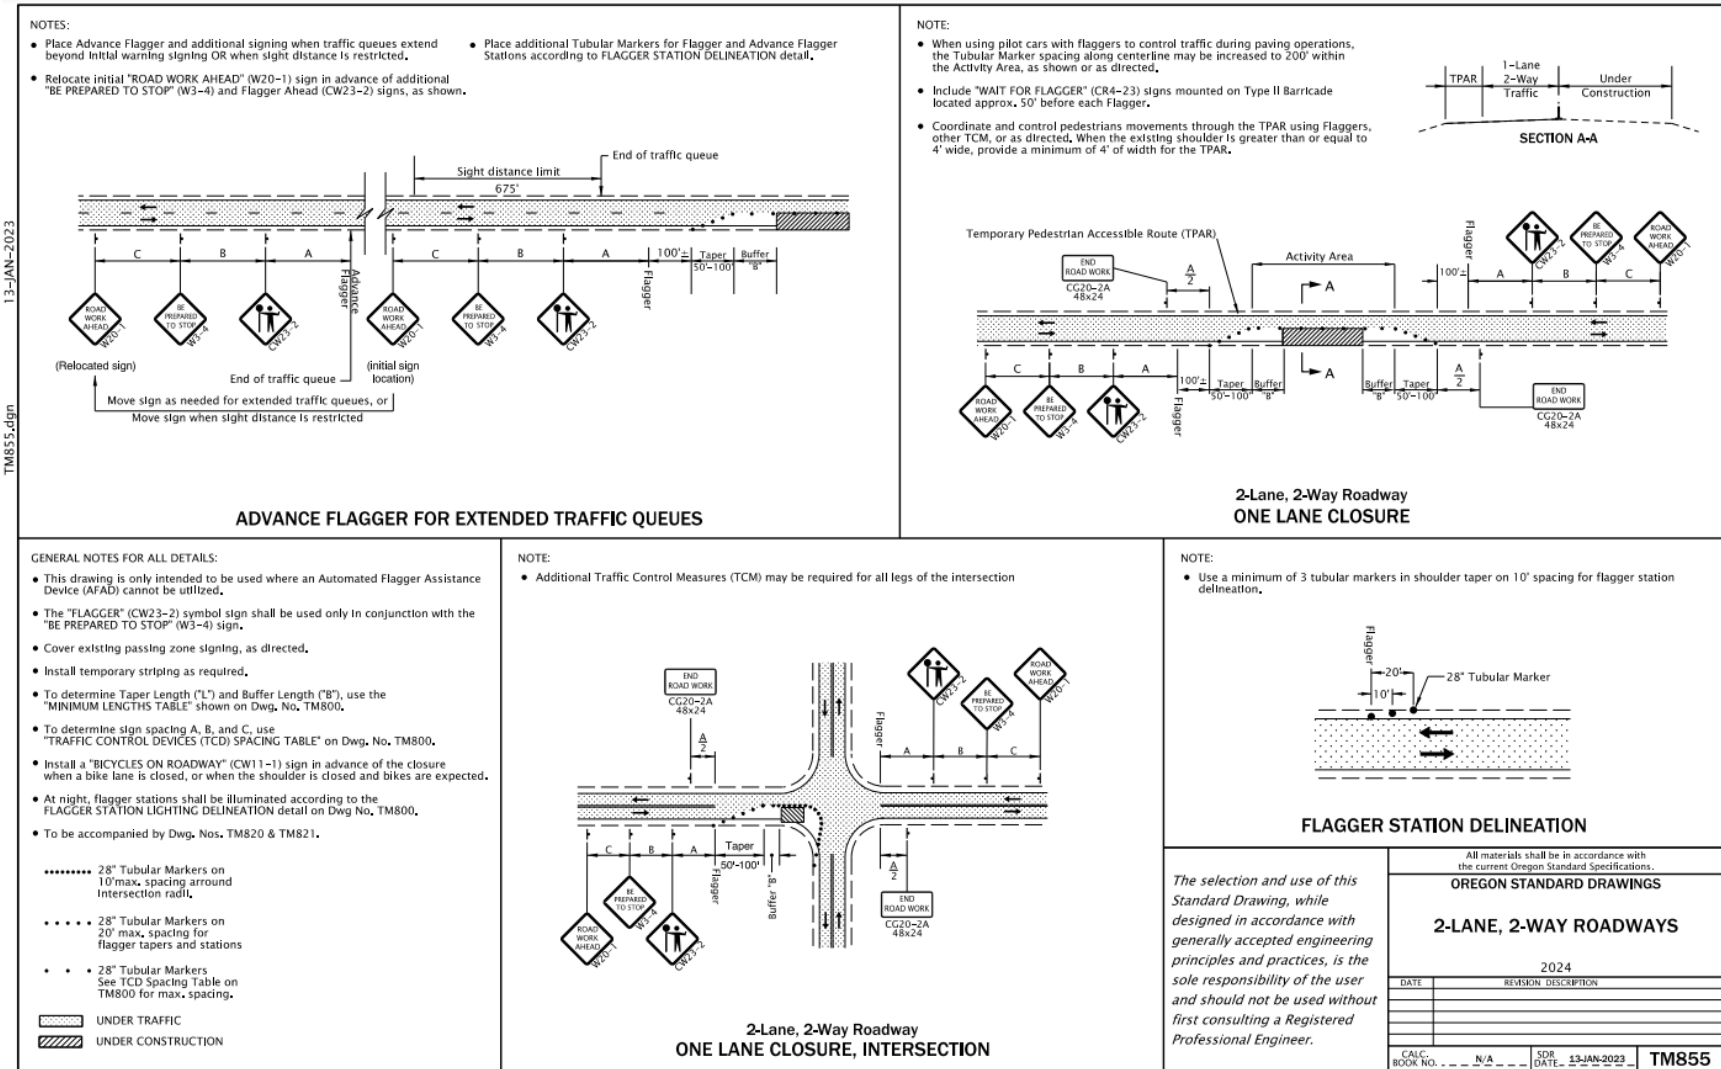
Example ODOT Traffic Control Plan Detail. 2-Lane, 2-Way Roadways – Flaggers.
